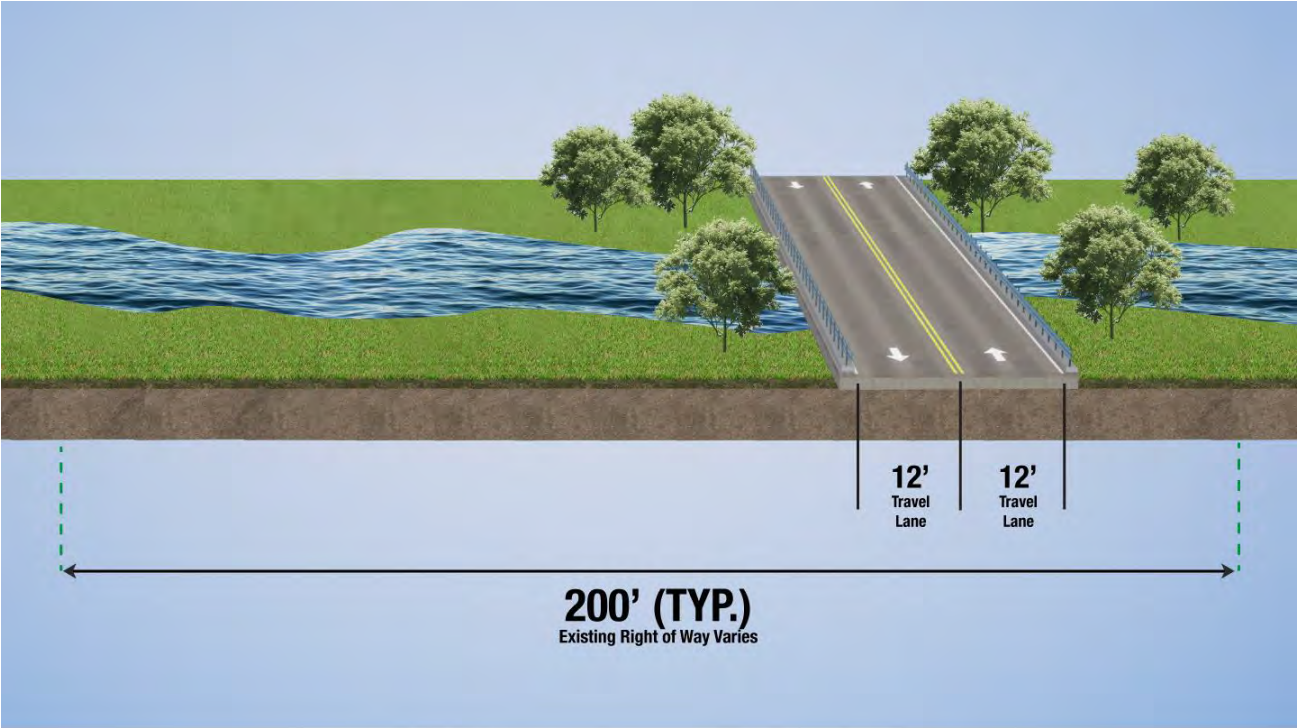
S.R. 70 Typical Section for Existing Bridges Over Whidden Creek and Joshua Creek
